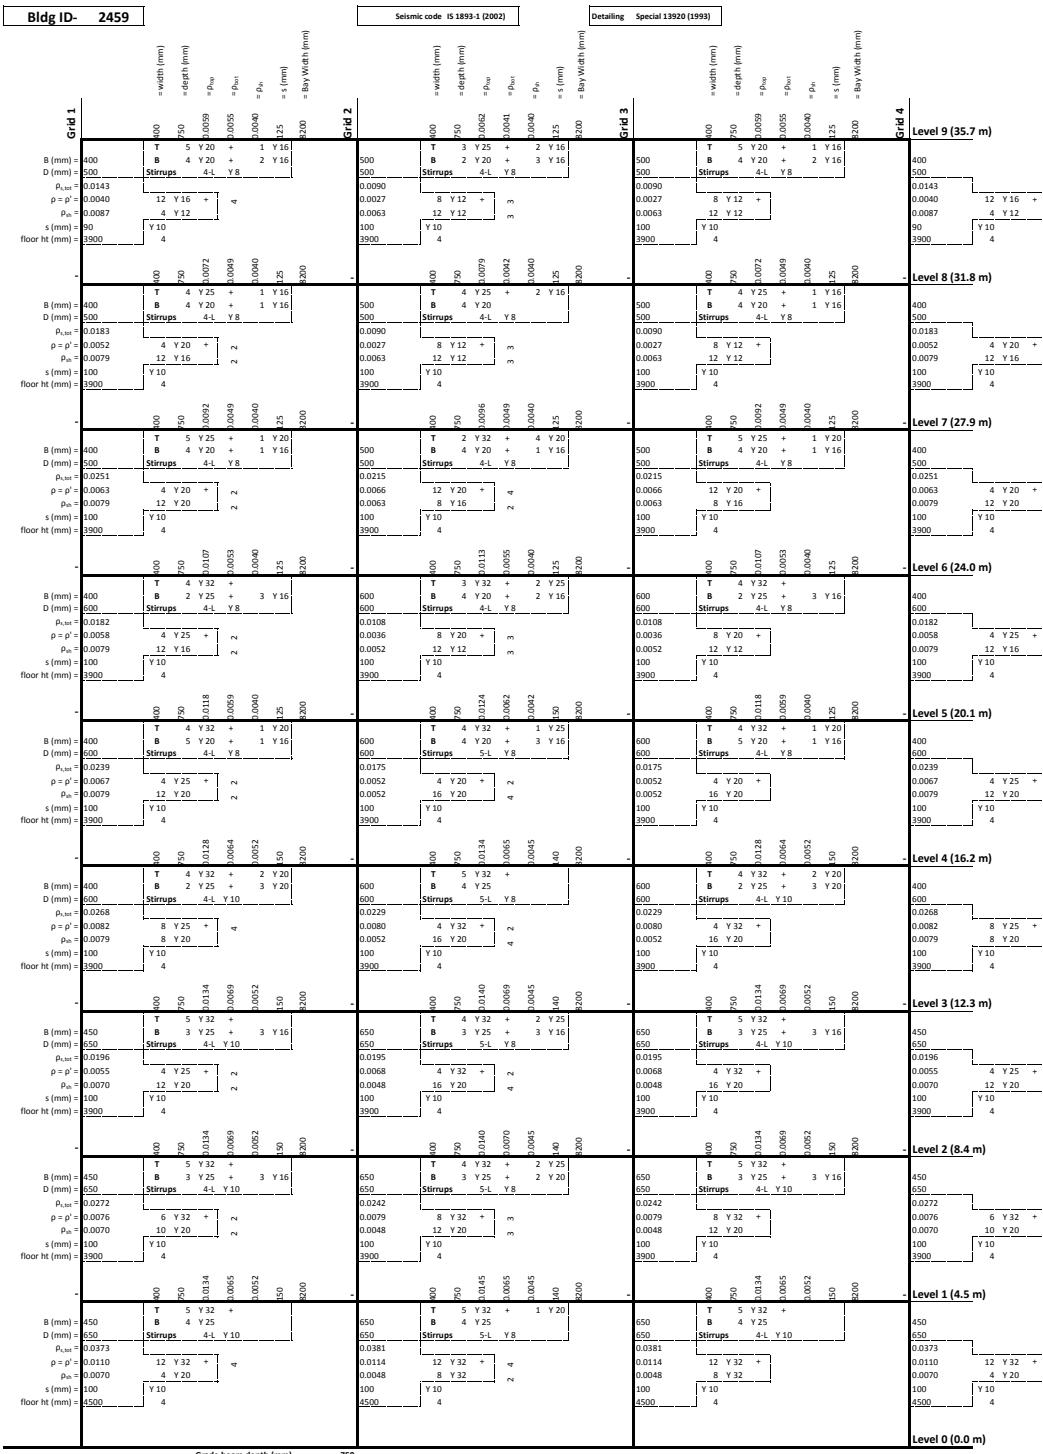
Provided reinforcement and modeling details for building ID 2459
